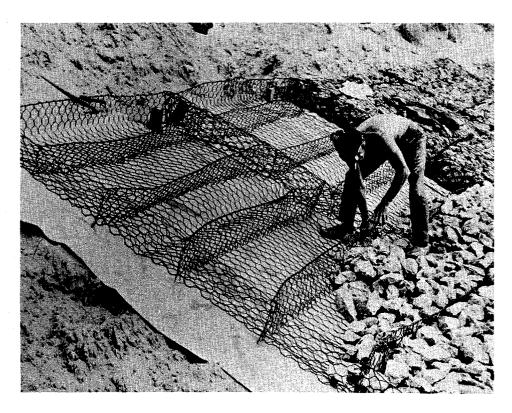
Rock and wire revetment mattress installation. (Courtesy, Maccaferri Gabions, Inc.)
